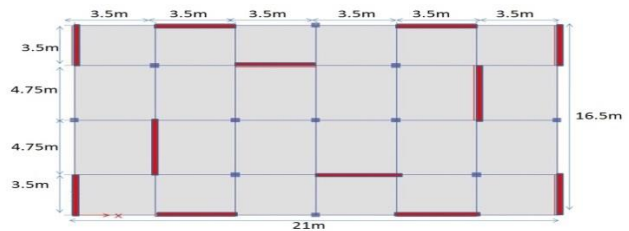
Plan of the building model with 1.5% shear wall ratio in each direction
